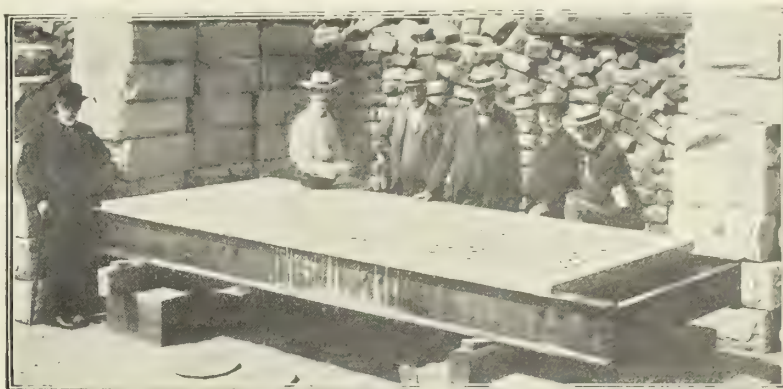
FINISHED SLAB OF GLASS AND CONCRETE
